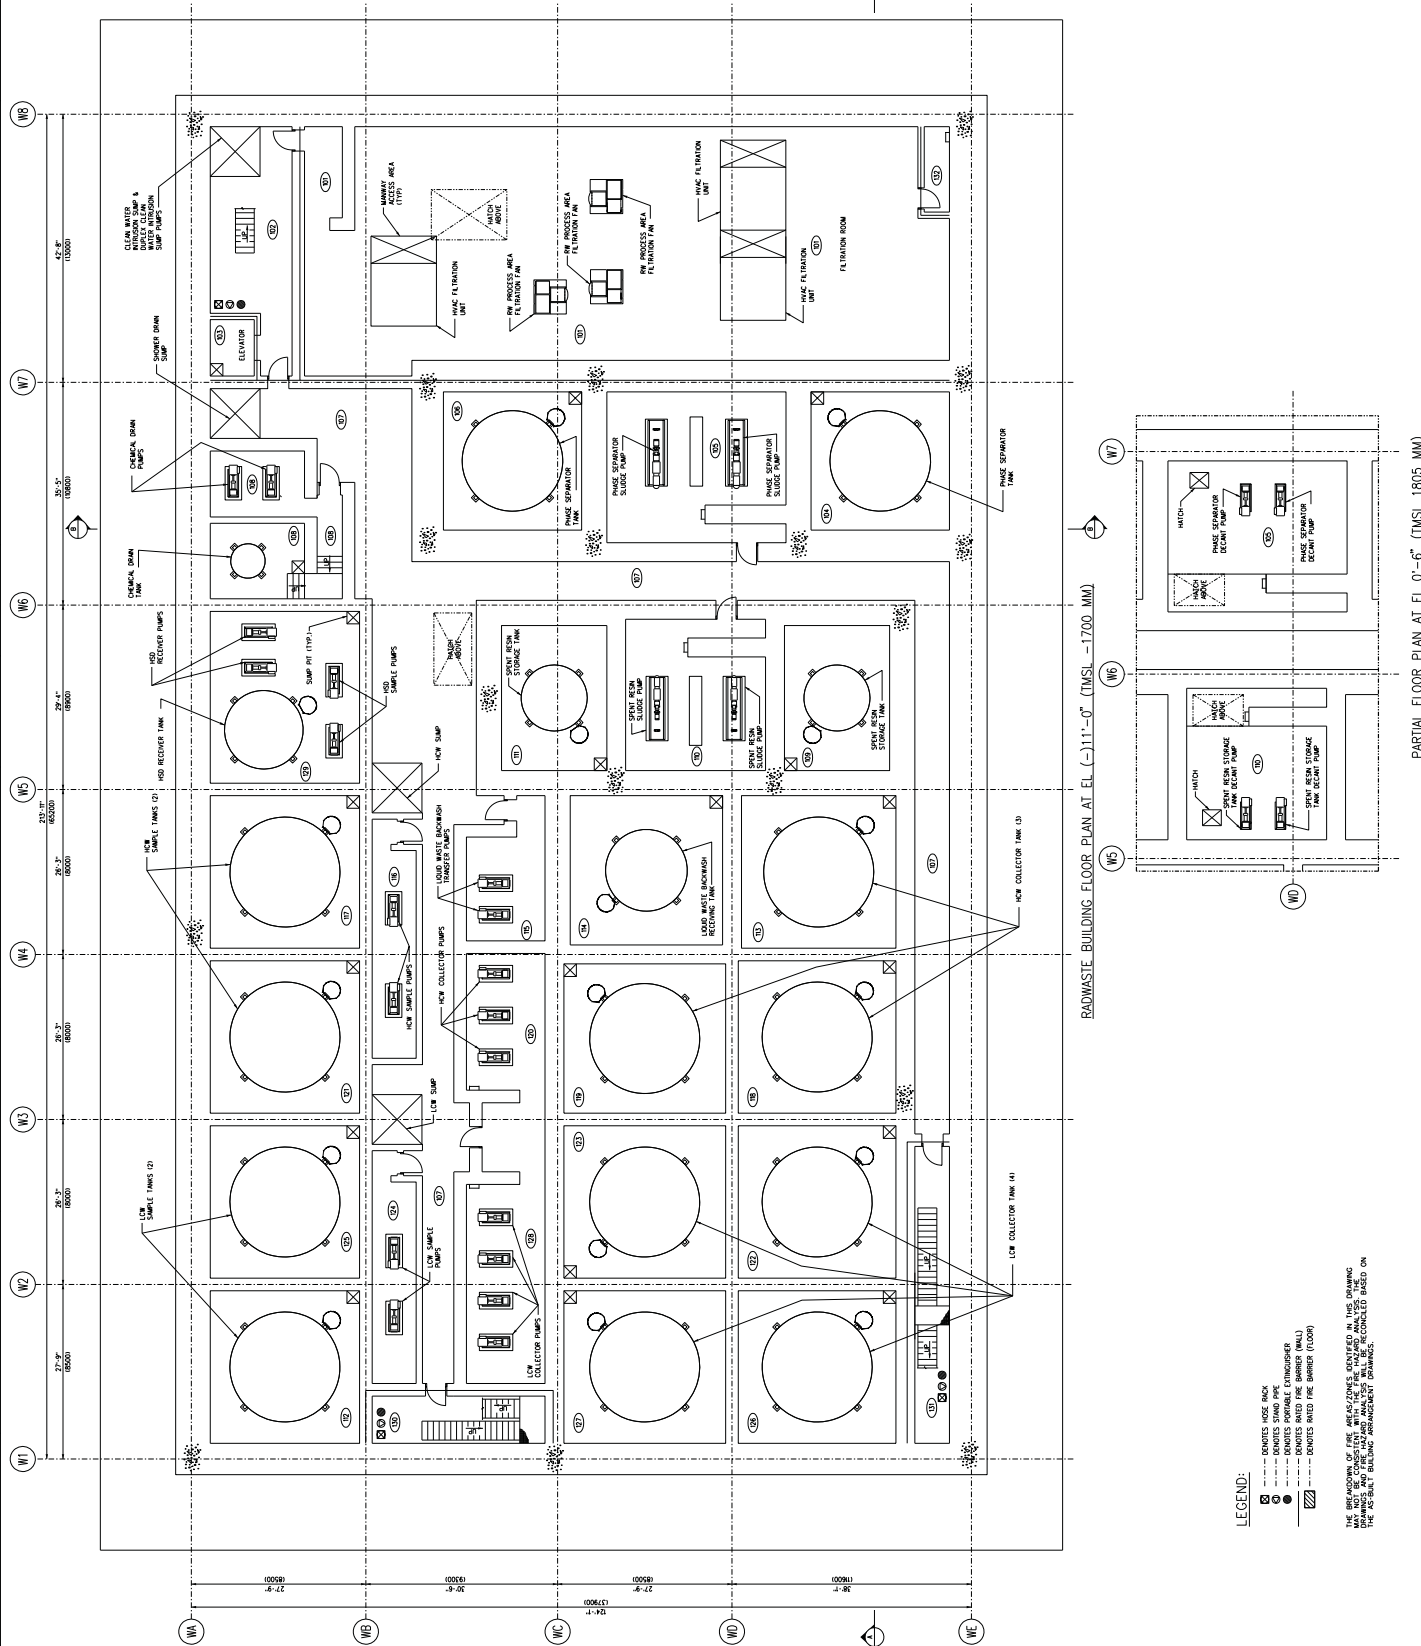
A.4-29 RADWASTE BUILDING, FIRE PROTECTION, AT ELEVATION -1700 MM
